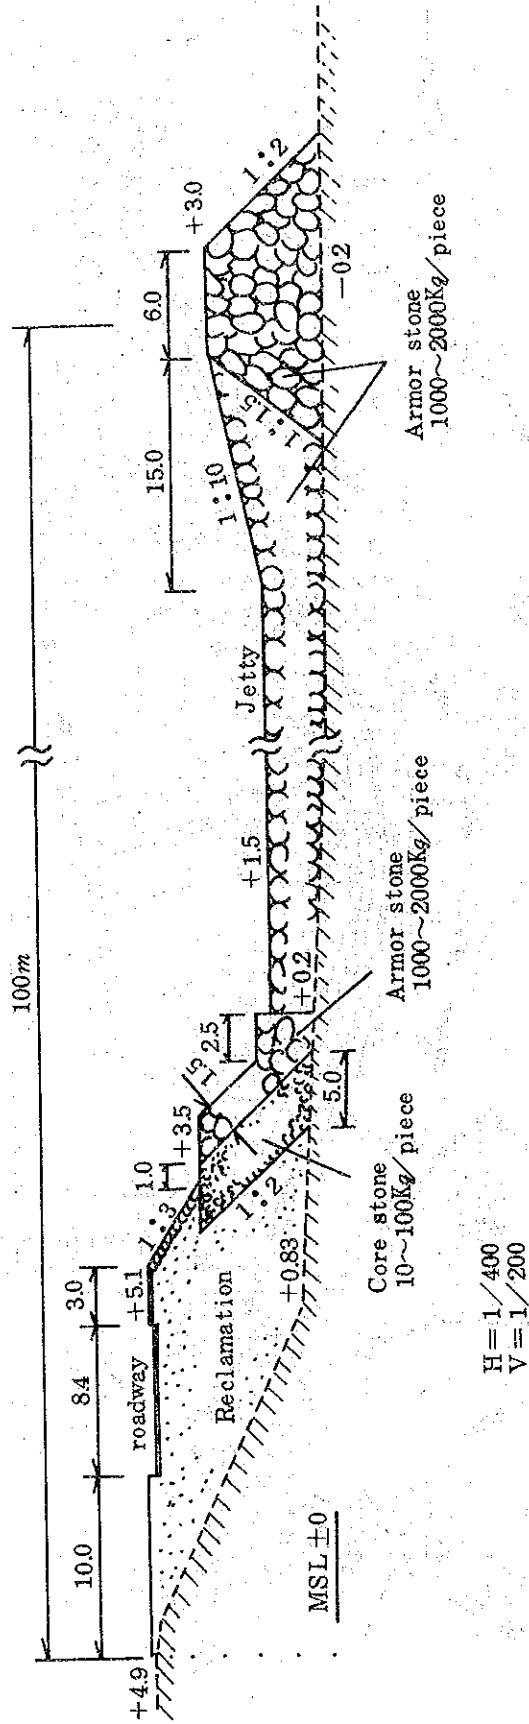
4 Seawall and Detached Breakwater profile (d-d section)
